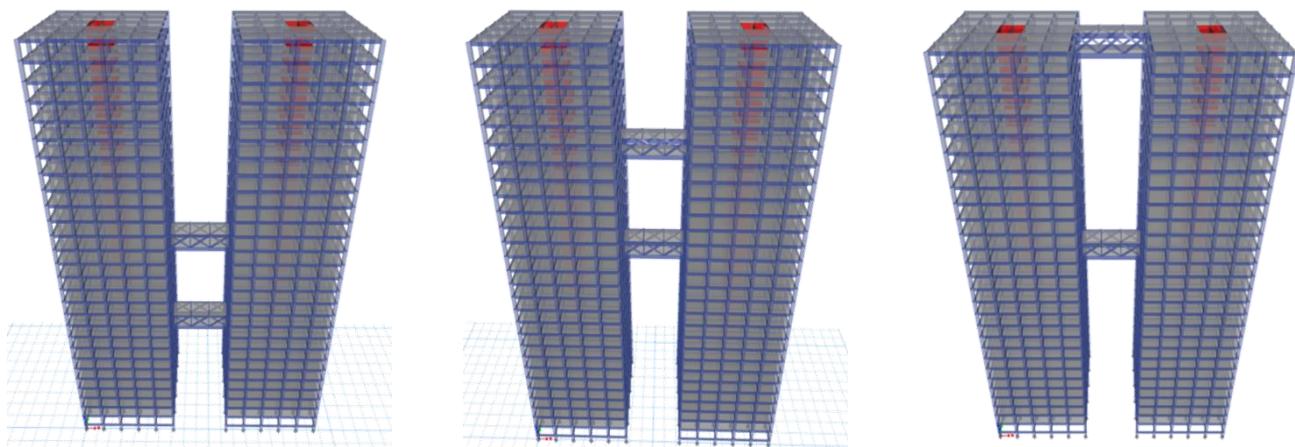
Two skybridge at a time on the 14th & 7th floor, 14th & 21st floor, 14th & 28th floor
